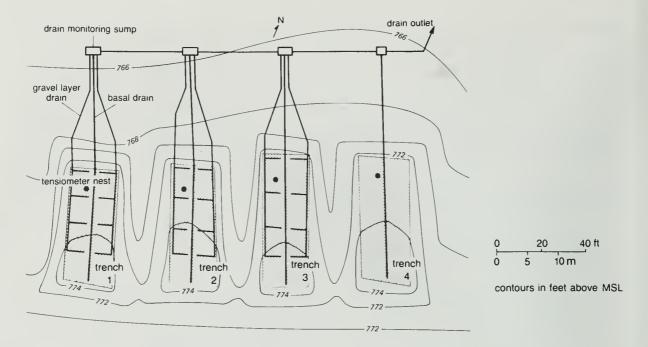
Plan view of experimental trench covers at the Sheffield study site.
